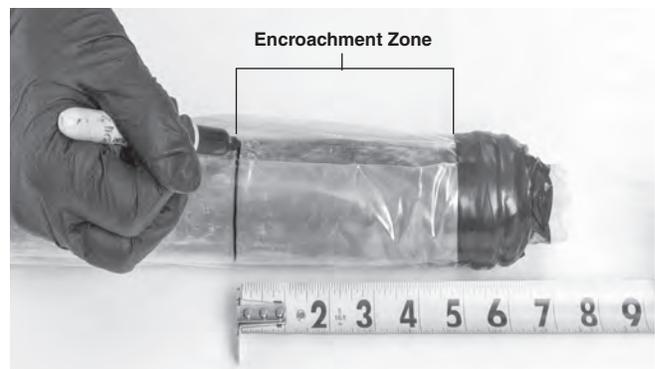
A – Marking Encroachment Zone/Patch Ends On Packer Sleeve
